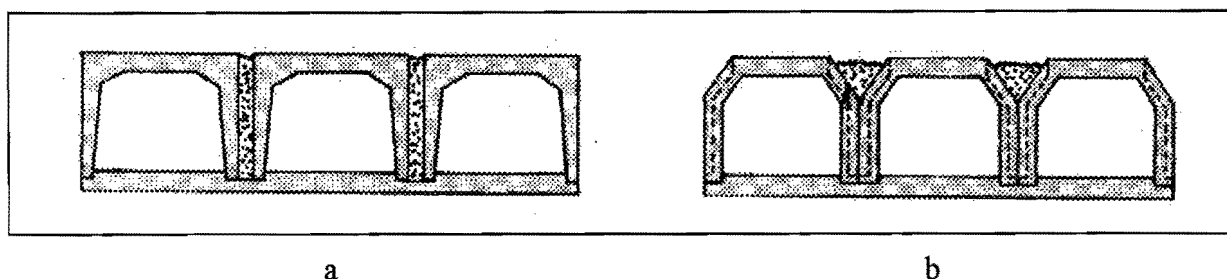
Types of box culverts: (a) Rectangular portal culvert units and (b) ribbed skew haunch culvert units.
